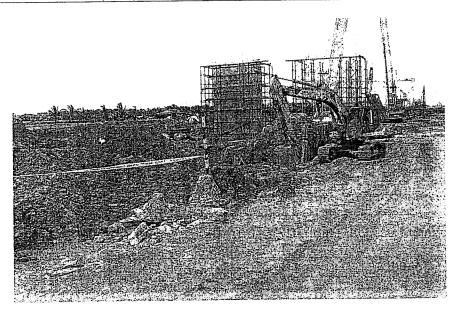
Construction of the abutment piers on the banks of Kien Thuy
